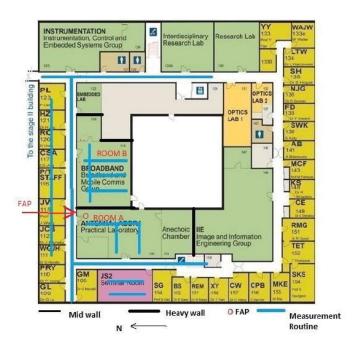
Floor Plan and Femto Access Point Position in [50]
